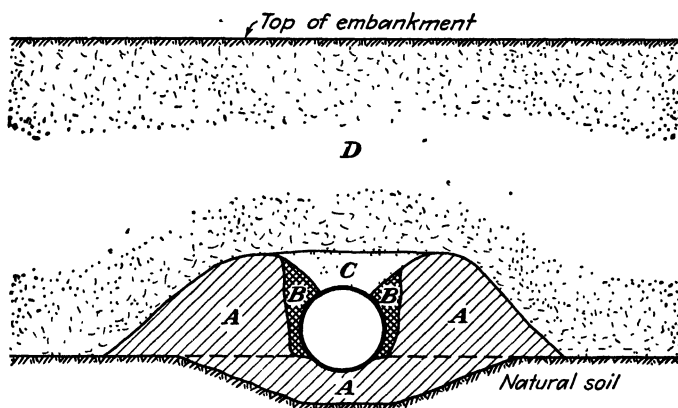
Recommended procedure for the construction of embankments over conduits. (After O. K. Peck and R. B. Peck, Ref. 261, 1948.)
